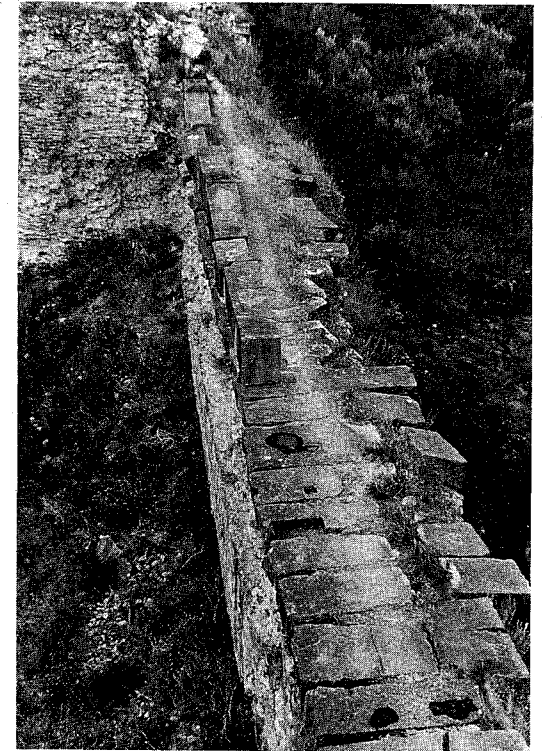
W22/23 with wallwalk and parapet of spoils
